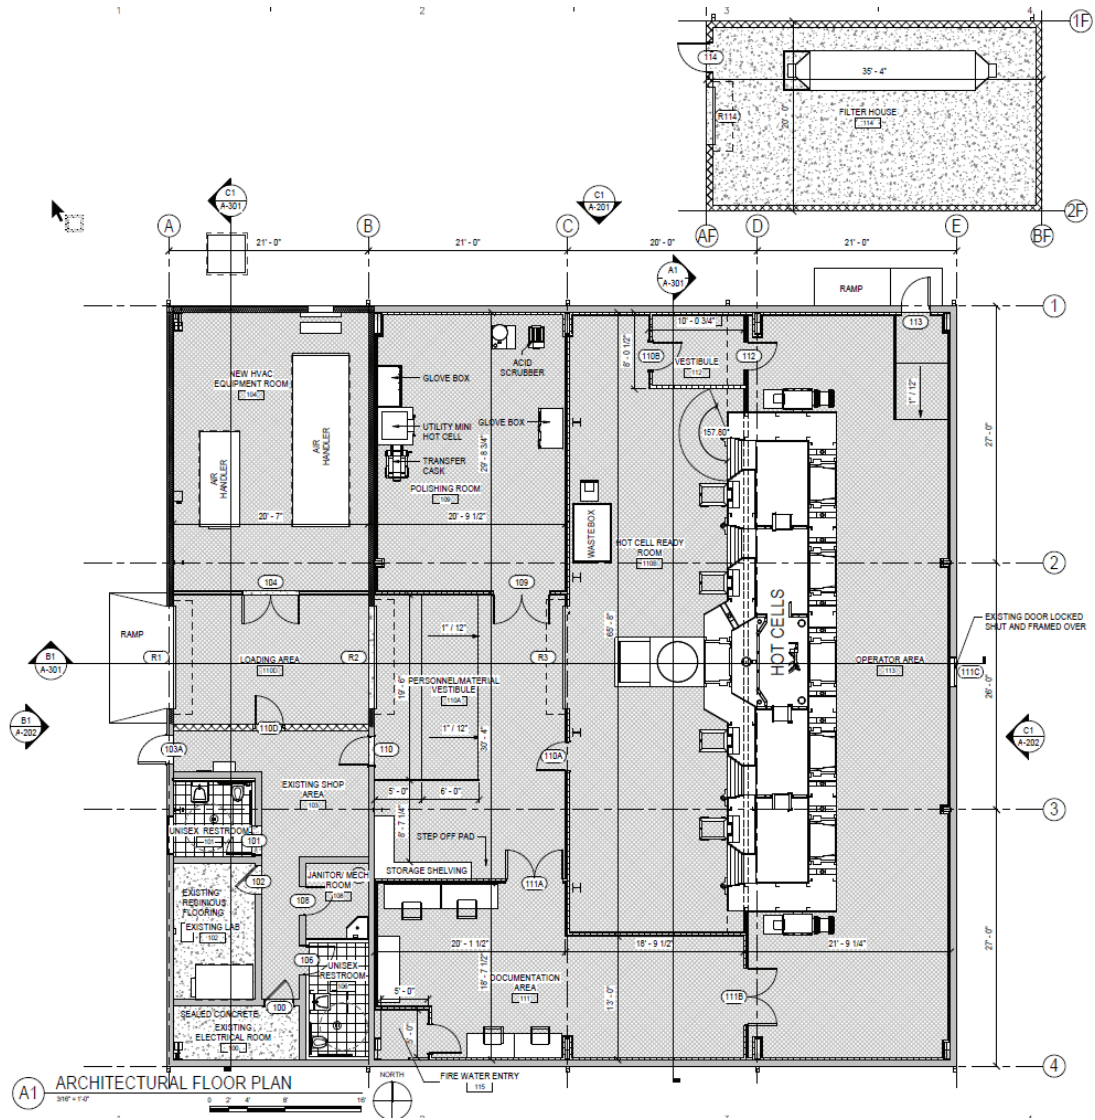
Proposed floor plan for CARP facility with air handling building addition.
